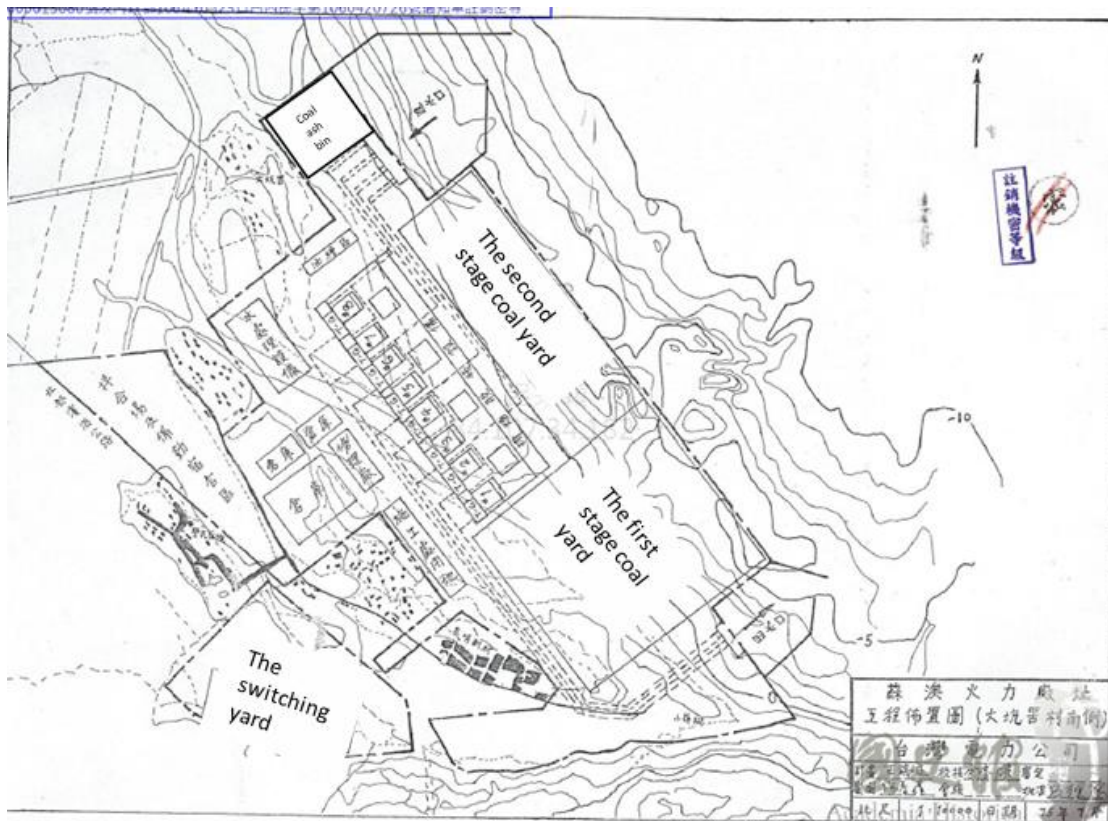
A diagram for constructing the Su-ao thermal power plant in 1986.
